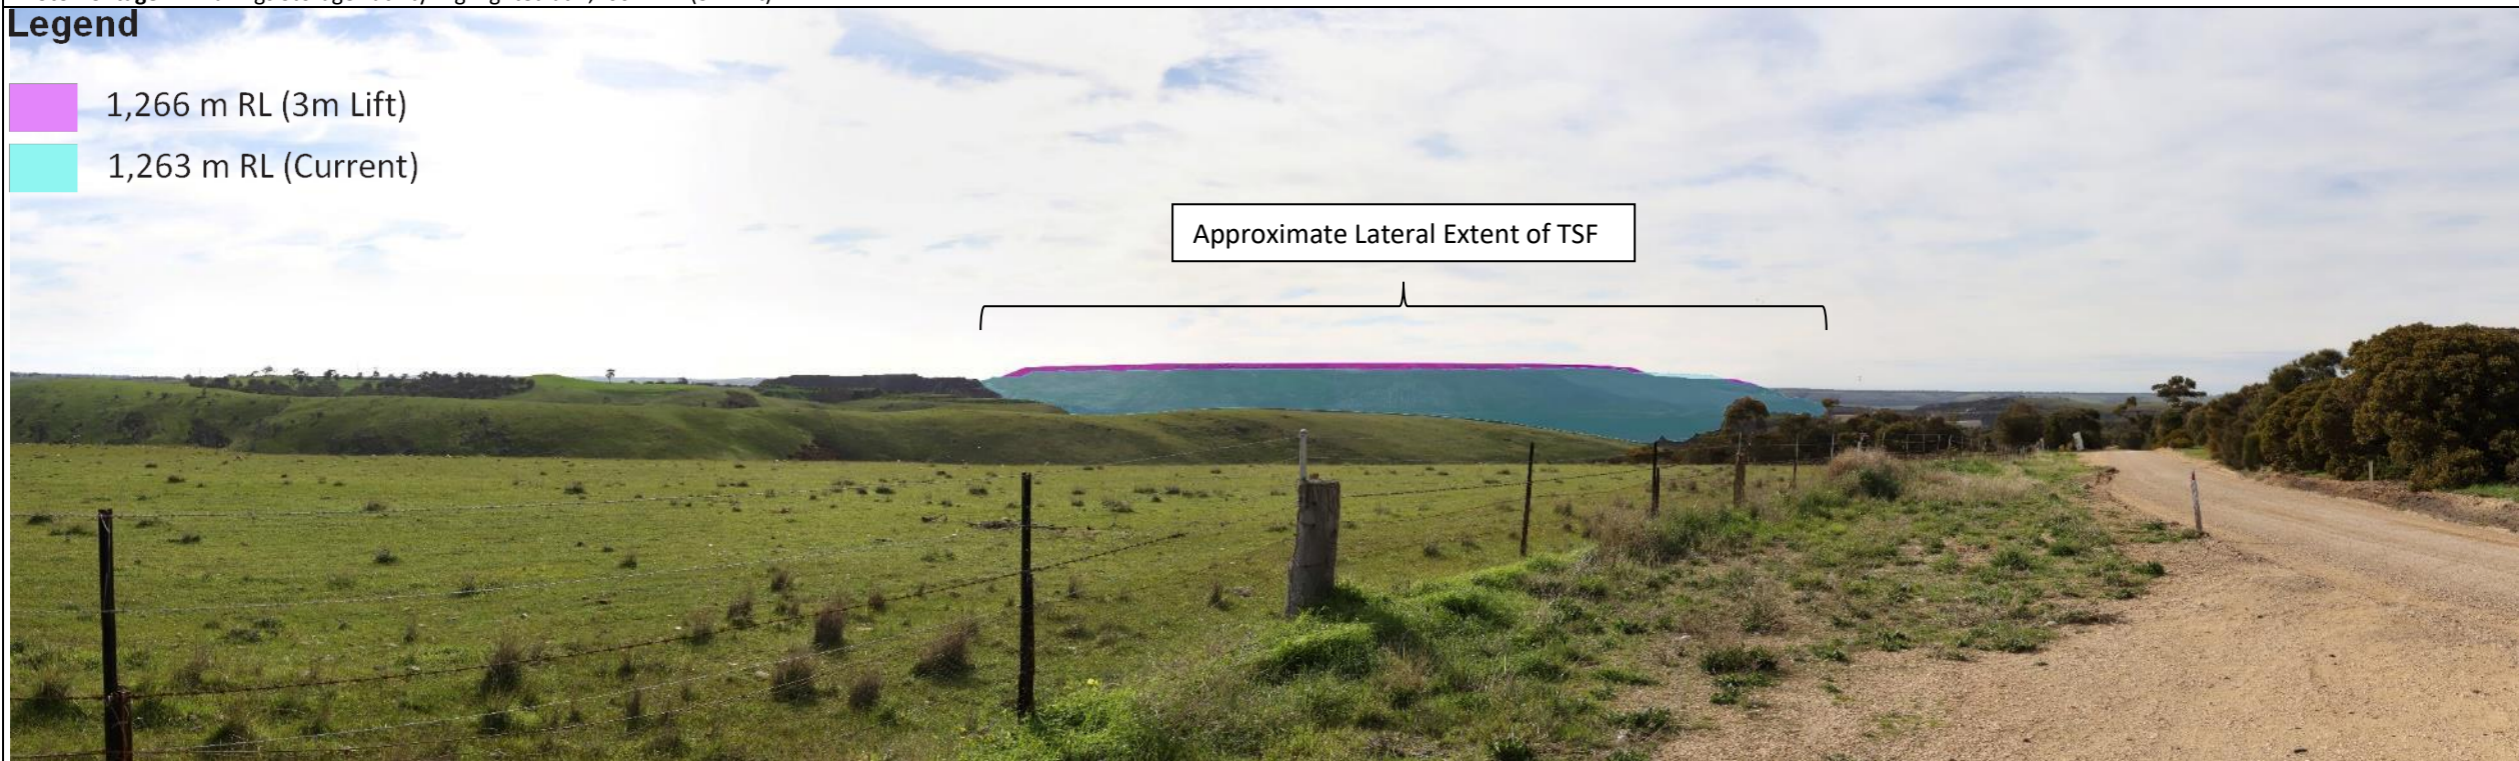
A: Tailings Storage Facility at 1,266 m RL (3m Lift)
